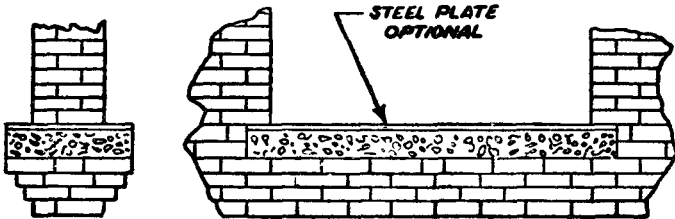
Concrete sill supported by a corbel of brick used with combustible floors.
